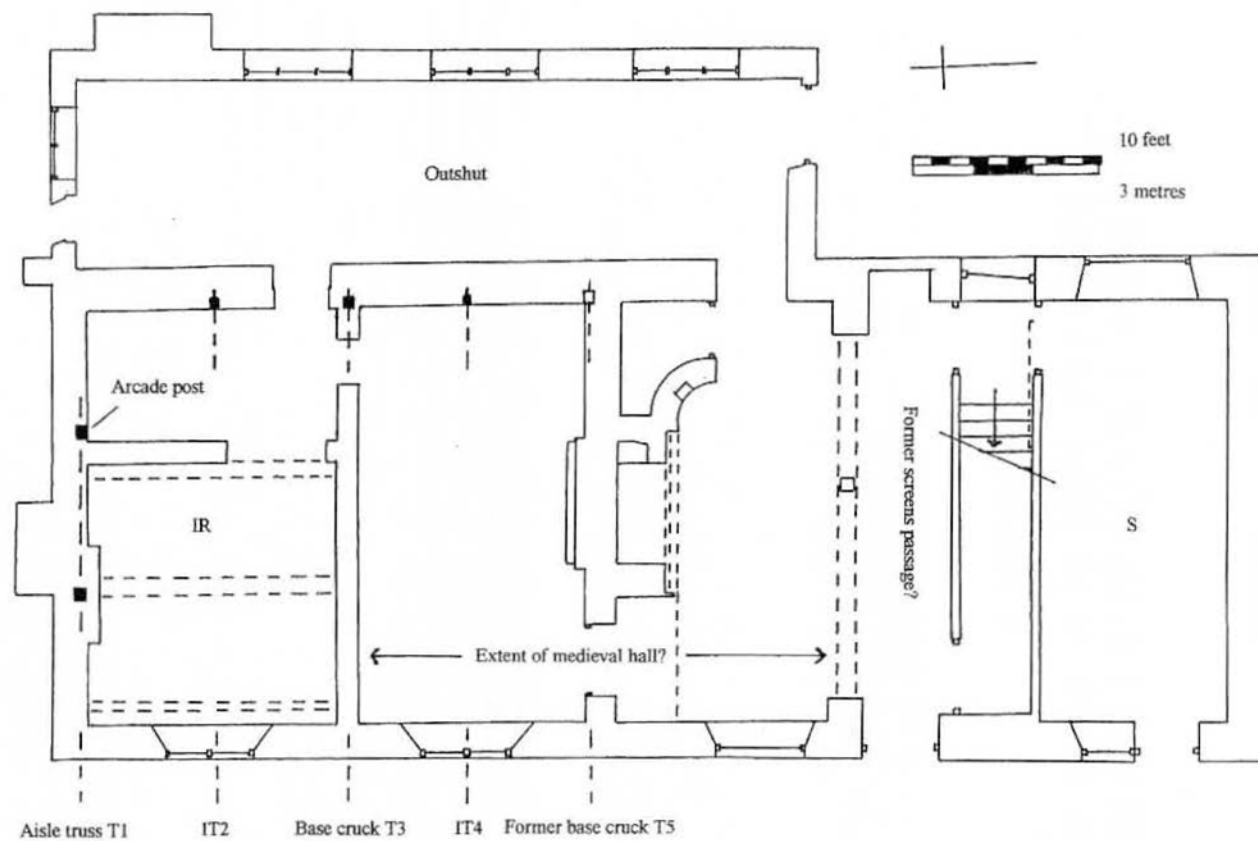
Ground plan of Garnival's Week farmhouse, showing the positions of medieval roof trusses visible on the first floor and/or in the roof space.
